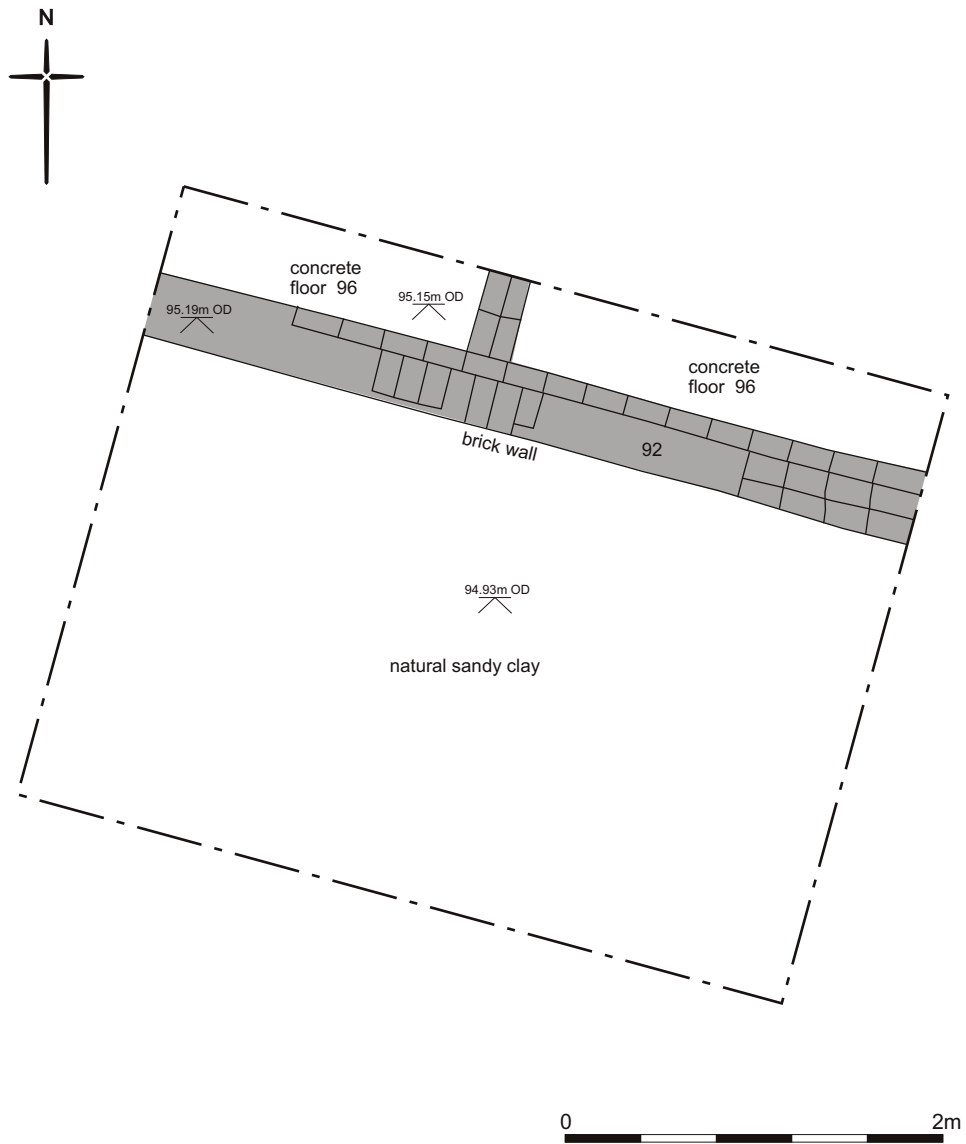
Test pit 8, plan of floor and south wall of North Wing
